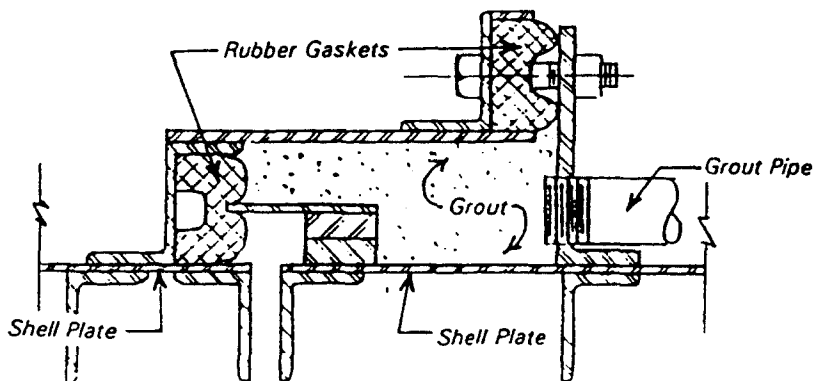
Joint detail for the Detroit River Tunnel (1910).
